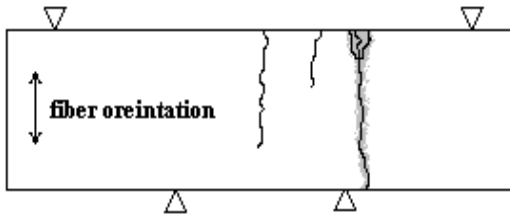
Typical crack pattern and failure mode for beams reinforced at 45° for shear with Replark.
